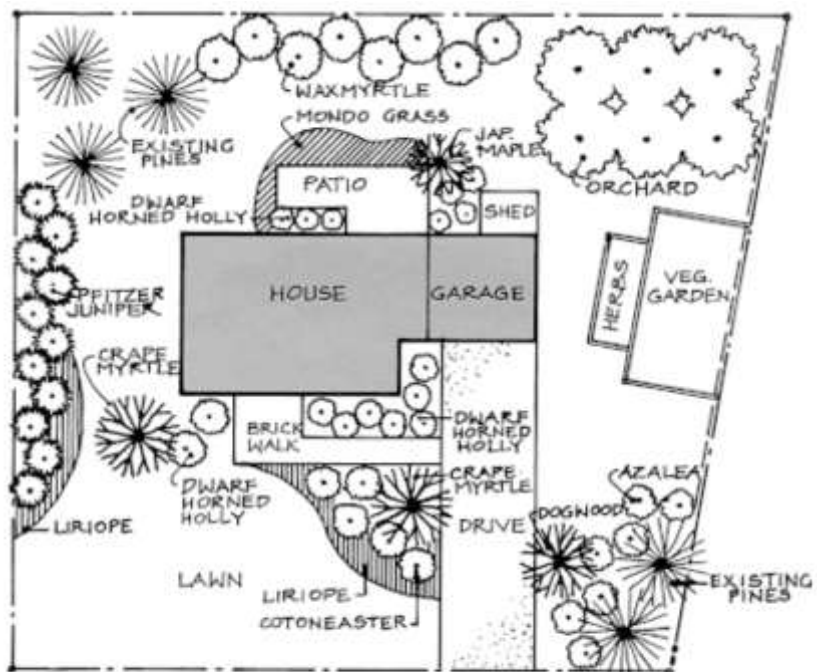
The final planting and construction plan. Plants used are listed on the following page.
